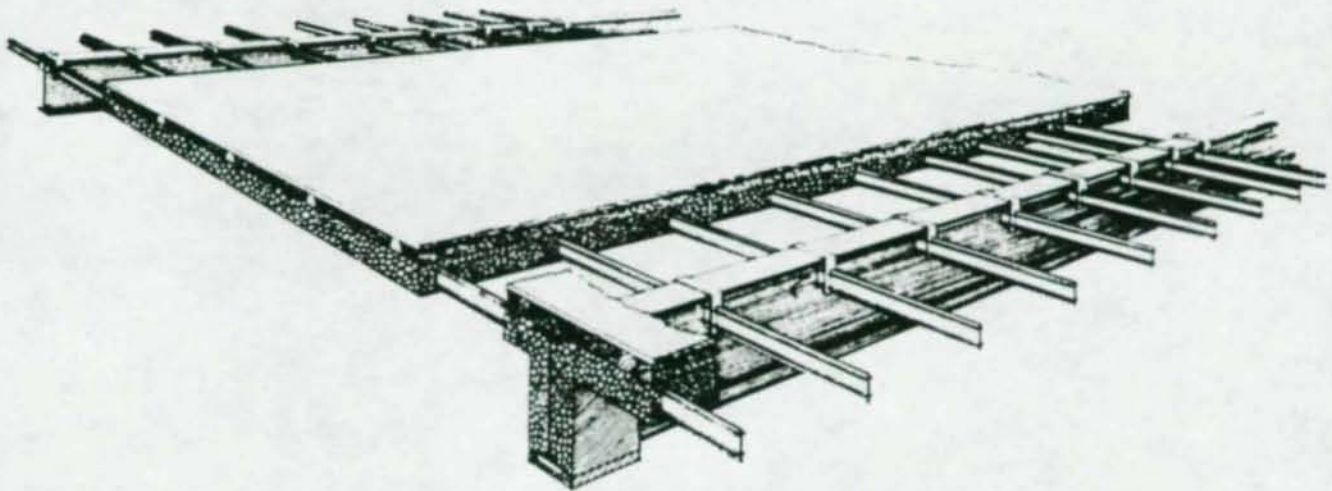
VIEW OF FLOOR WITH HEAVY BARS SUSPENDED IN STIRRUPS
